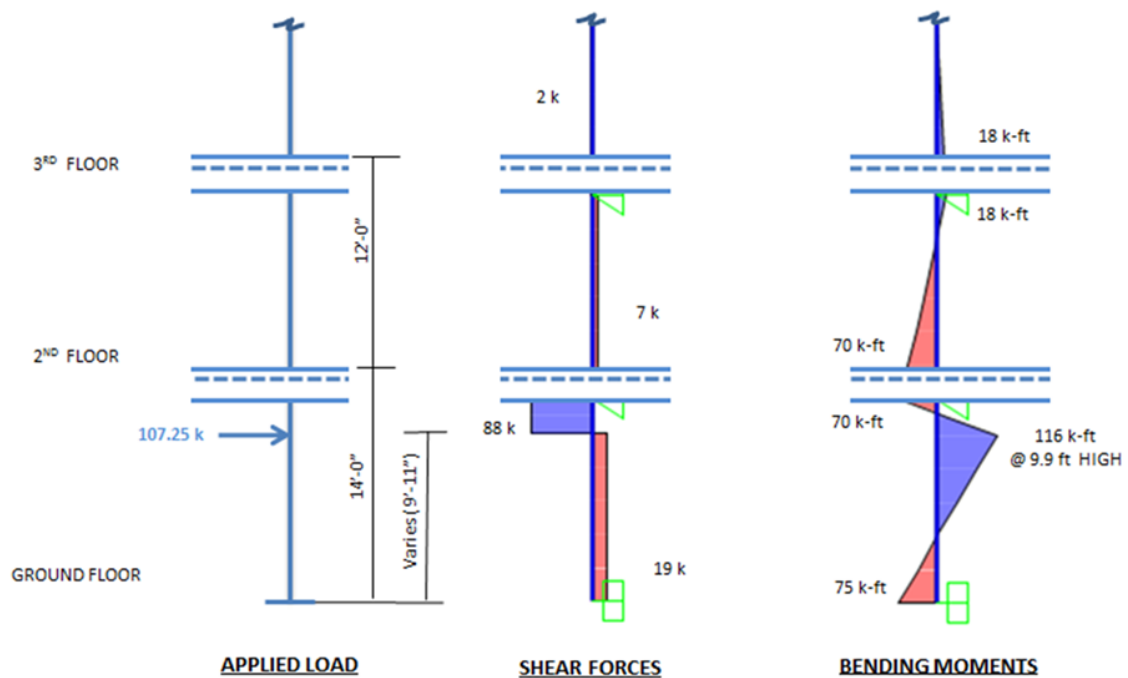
Impact load applied at "d" away from the top of the column on the ground floor level
